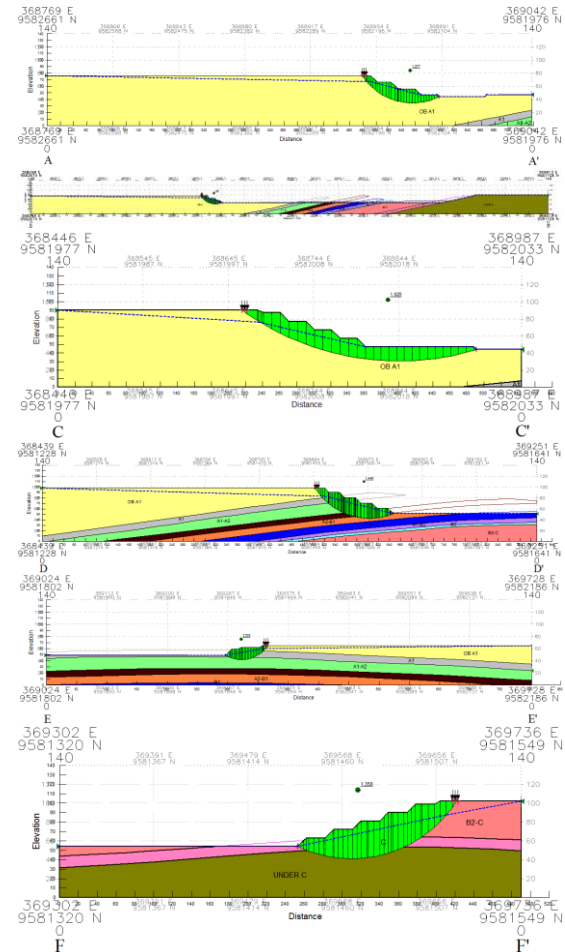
Factor of Safety (FoS) of the 2016 Mine Plan in Banko Barat Pit 2 Based on Six Cross-Sections
